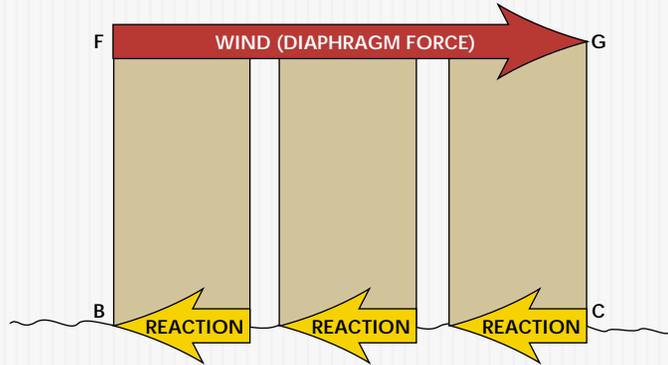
Shear wall anchor bolts - transfer shear forces into foundation
